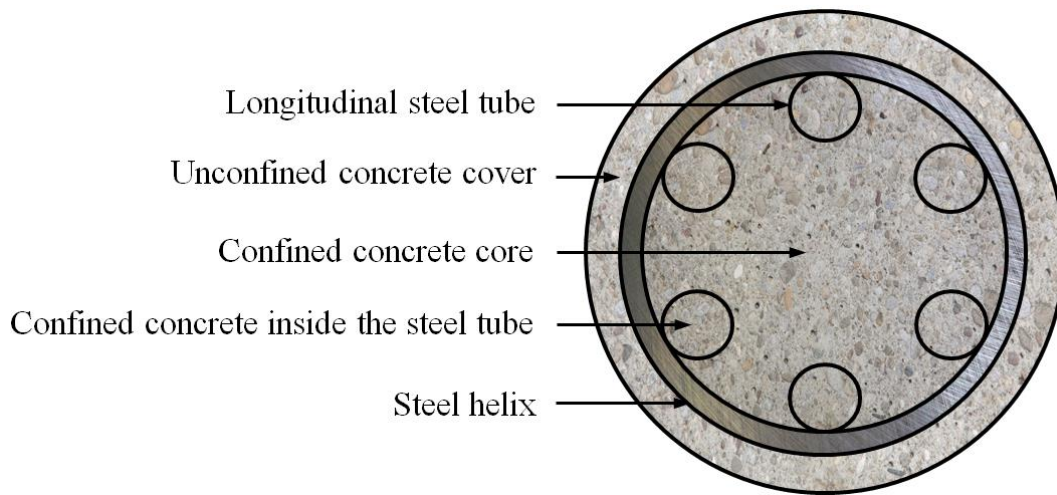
Schematic of the SCC column reinforced with steel tubes
